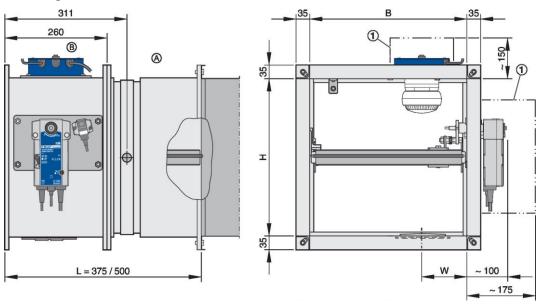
FK-EU with Belimo spring return actuator and duct smoke detector
